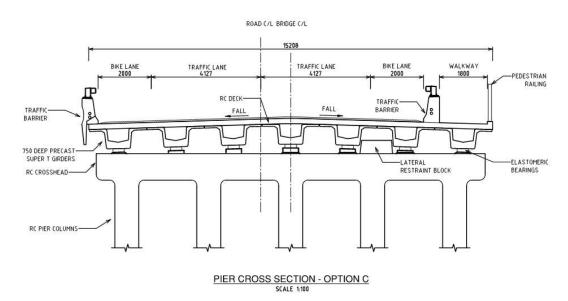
Edwards Bridge Renewal: Option C – Typical elevation and section
